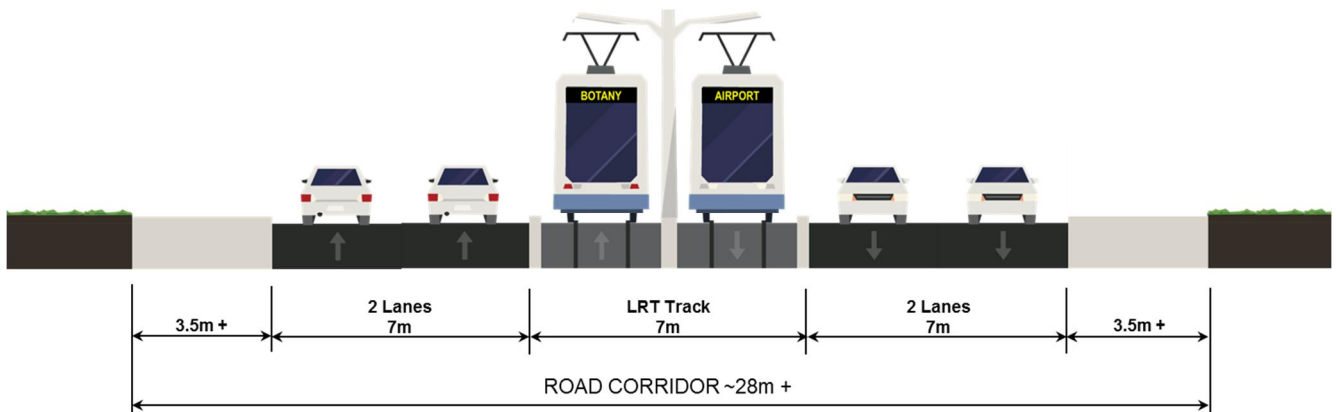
East Tamaki Road / Springs Road - typical cross section
